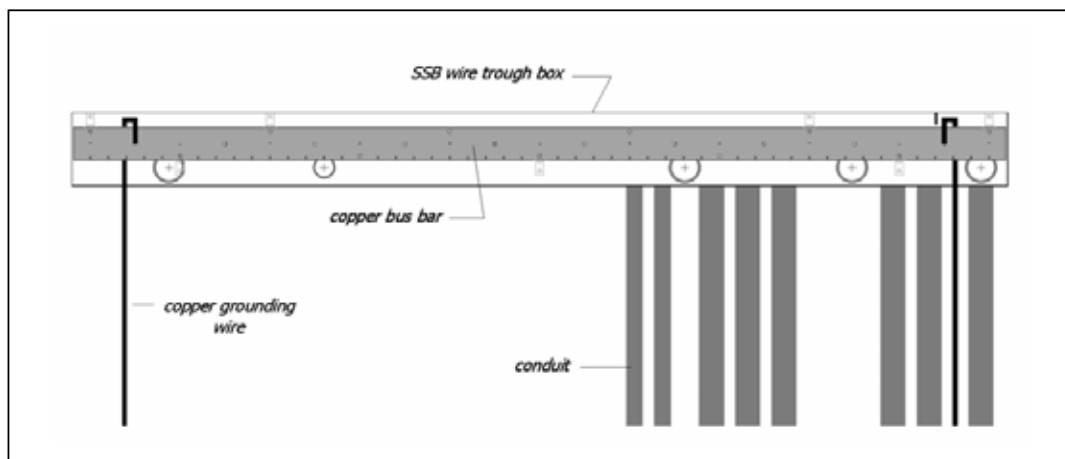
A typical SSB wire trough "standard model" layout. Cross-section with major components labeled.
